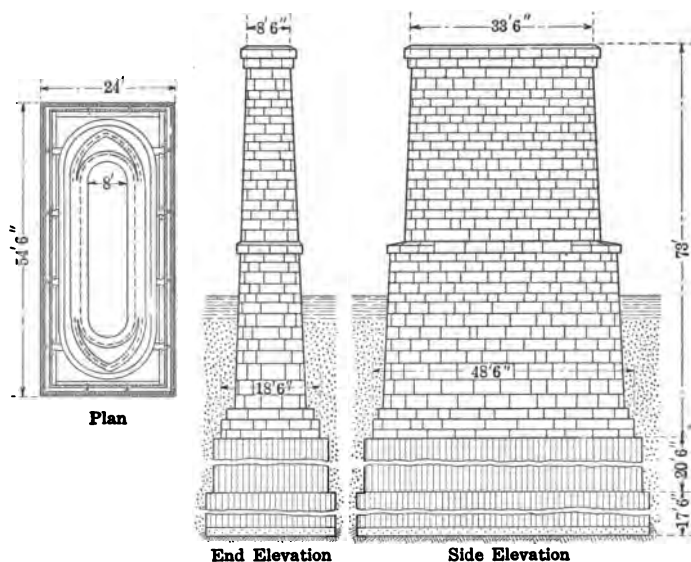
Pier of the Blair Crossing Bridge over the Missouri.
